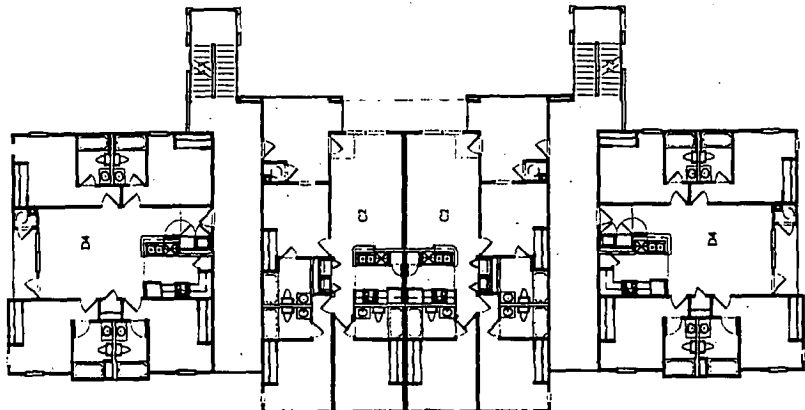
V - Building Type Xa - First and Second Floor Plans
